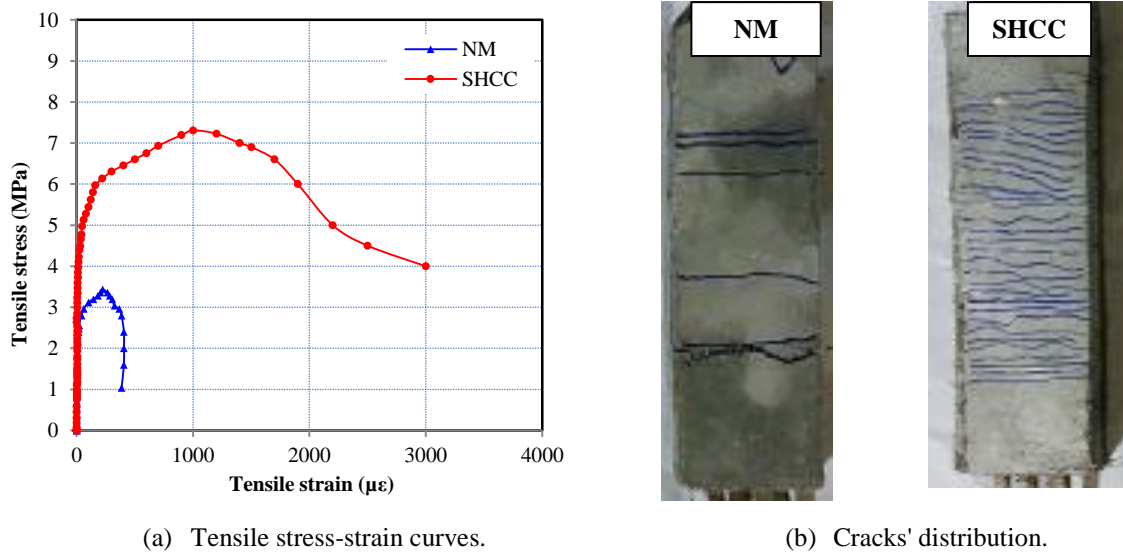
Uniaxial tensile testing of prism-shaped NM and SHCC specimens (All dimensions in mm).
